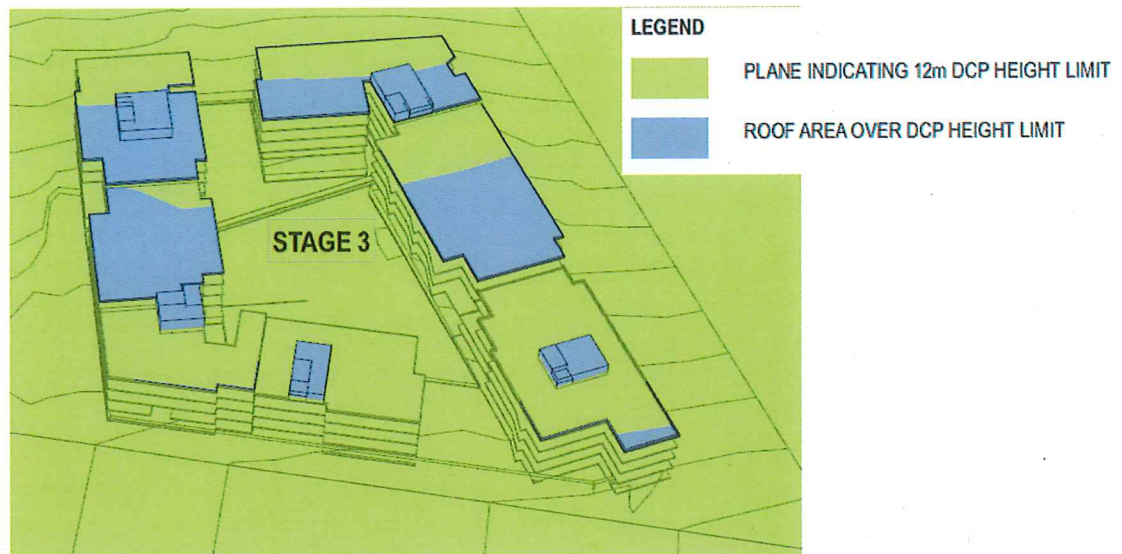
Extract from Height Plane Diagram demonstrating the approved Concept Plan (JRPP-15-02701 as modified in MOD-17-00493) for the Phase 3 buildings the subject of this DA. The parts of the buildings which exceed the 12 m building height limit are shown in blue. Rooftop plant and equipment exceeds the height limit by up to 3.4 m.
